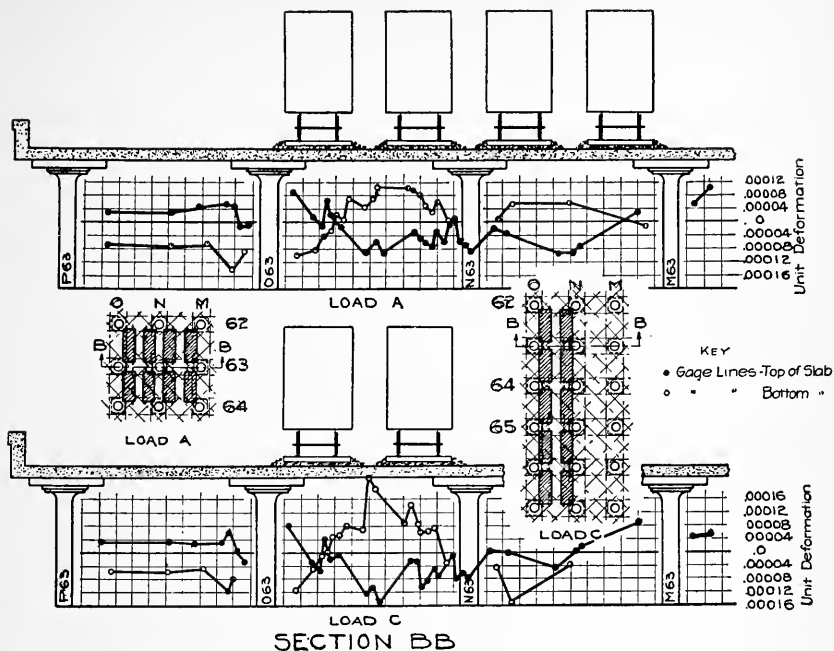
DEFORMATION ALONG SECTION B-B (NORMAL TO TRACKS) OF SOO TERMINAL TEST FLOOR.
